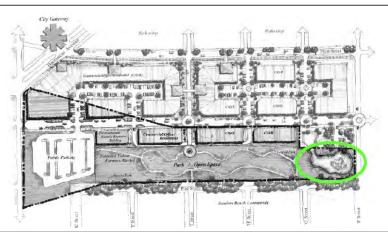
STORMWATER RETENTION POND LOCATION
